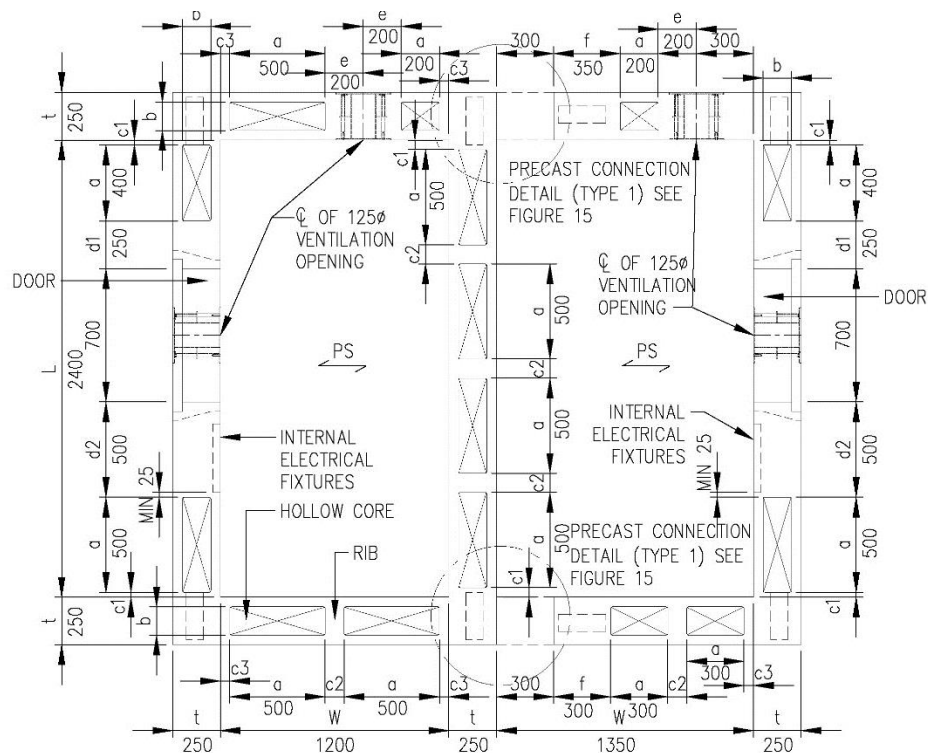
(iii). PRECAST HS AND C-SHAPED PRECAST HS CONNECTED AT THE LONGER WALL AND WITH HS DOOR ON LONGER WALLS (TYPE 5)
